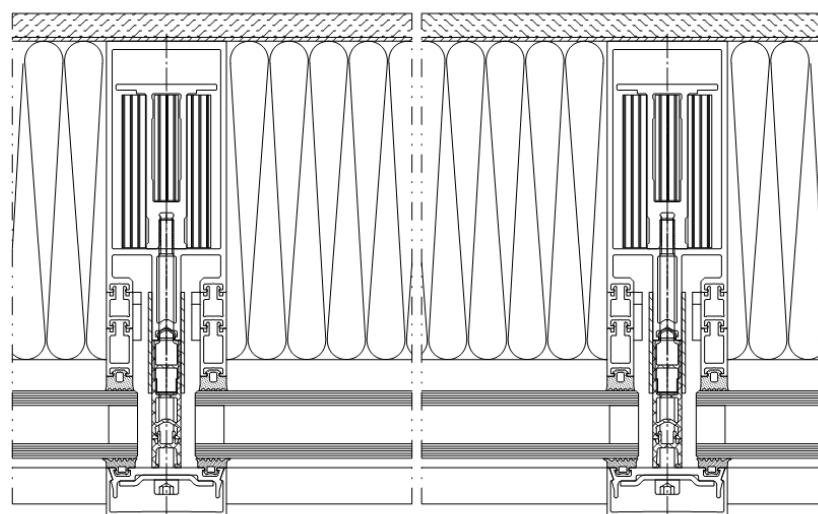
MB-SR50N EI EI60 system spandrel solution cross - section
